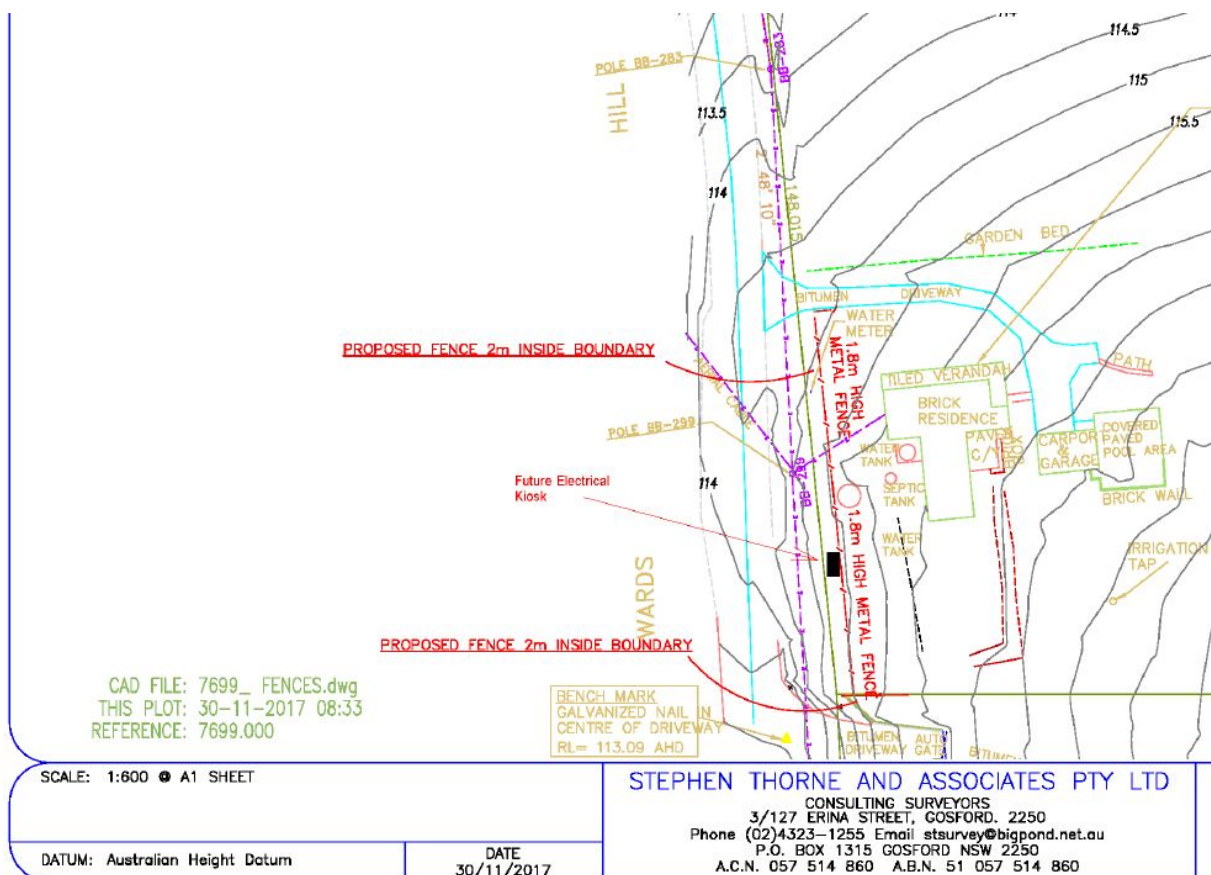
Part Site Plan with location of electrical kiosk substation indicated. Kiosk size 1.45m wide X 2.7m long X 1.7m high.
